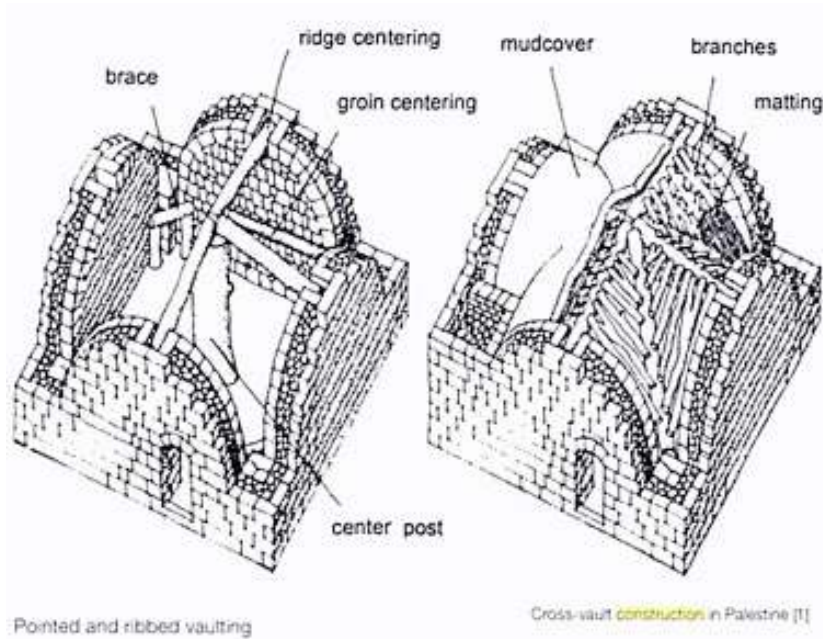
Cross vault construction in Palestine (pointed and ribbed vaulting).
